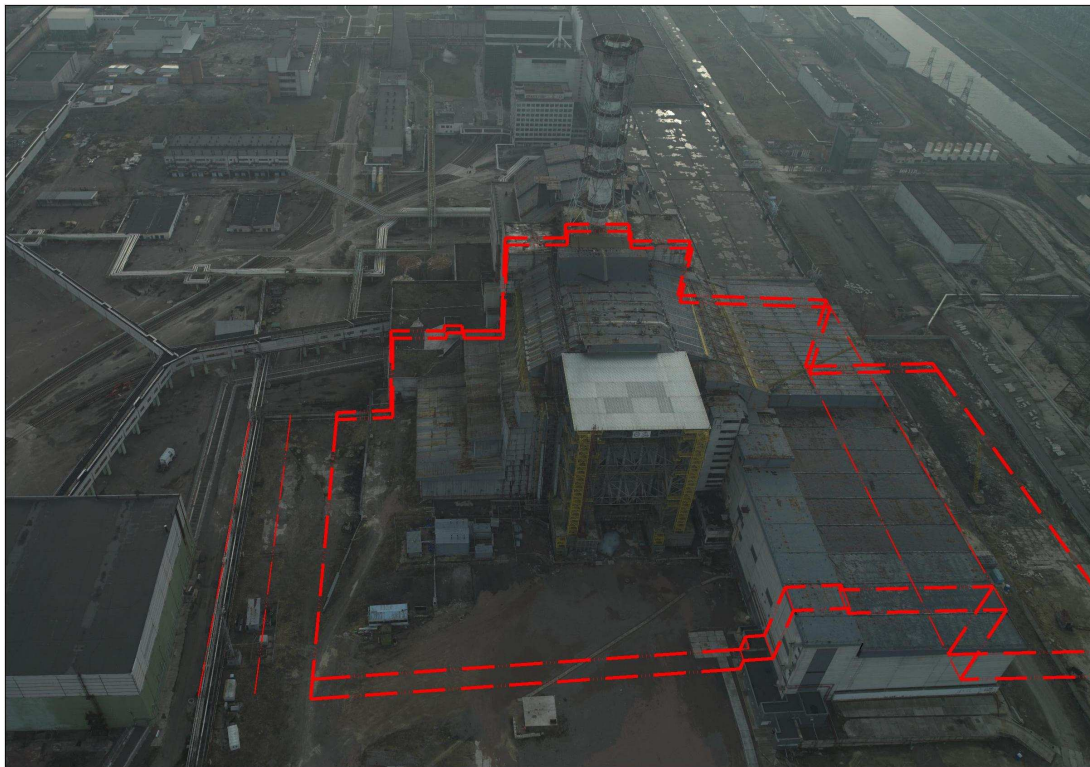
Layout of Constructed Foundations (FM-1 and FM-2) for MSS (Stabilization Measure 2)
